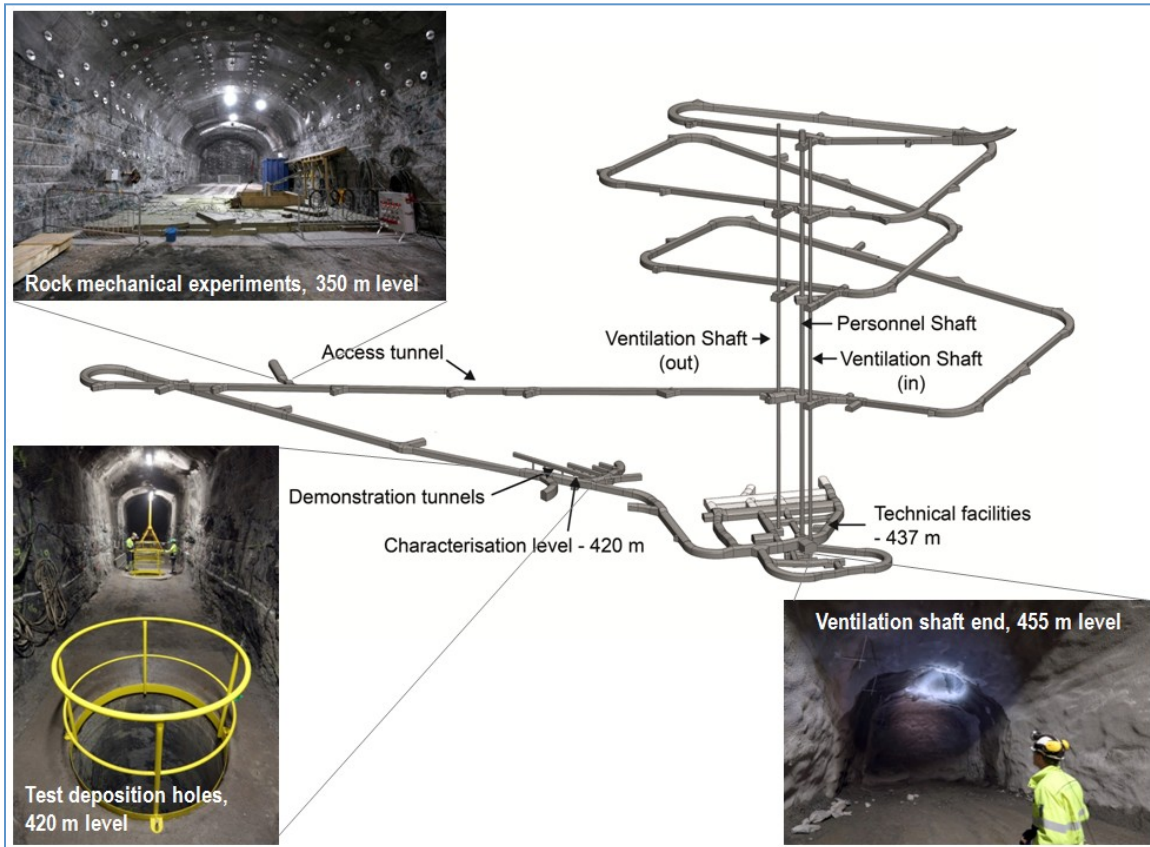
Layout for the ONKALO premises in 2015. ONKALO consists of the access tunnel (5 km), vertical shafts for ventilation and future personnel access, demonstration area at the characterization level 420 m and technical facilities. ONKALO will serve as the access route to the future repository.
